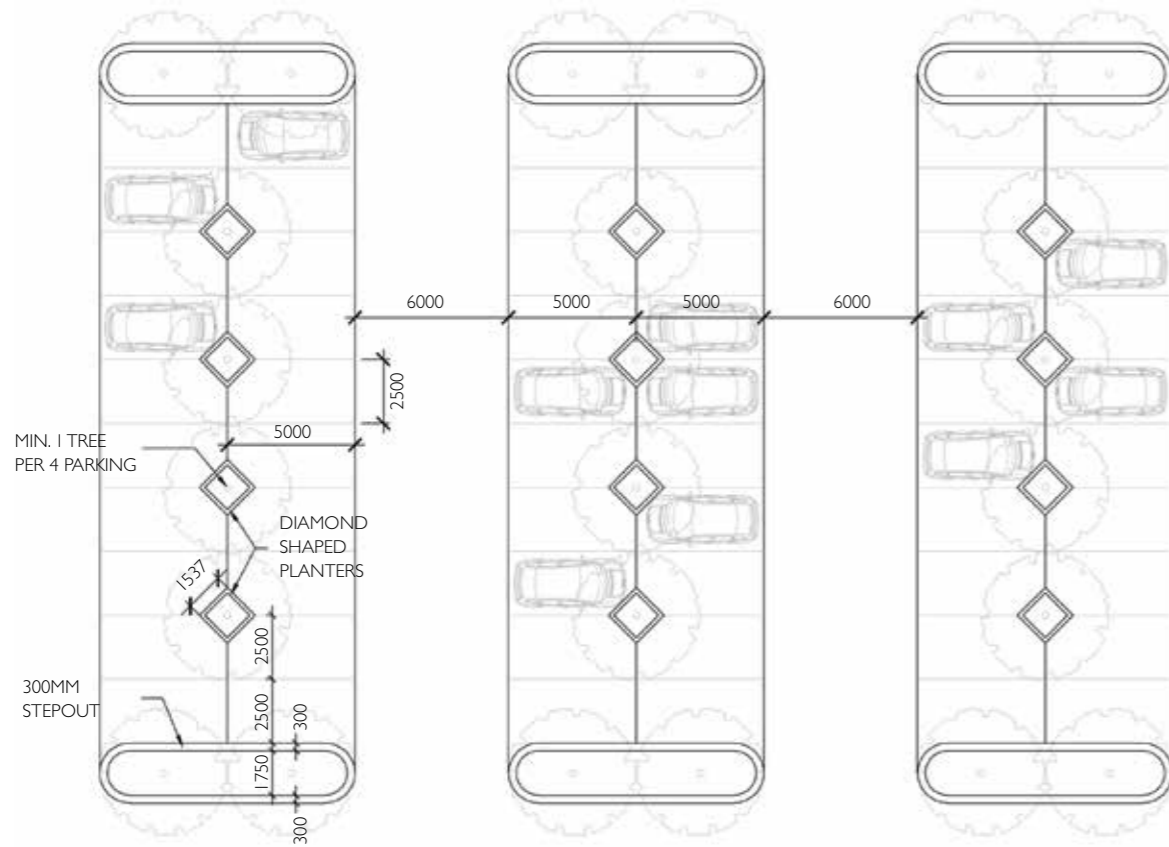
Shade Tree Layout in Parking Lots (with Diamond-shaped planters)
